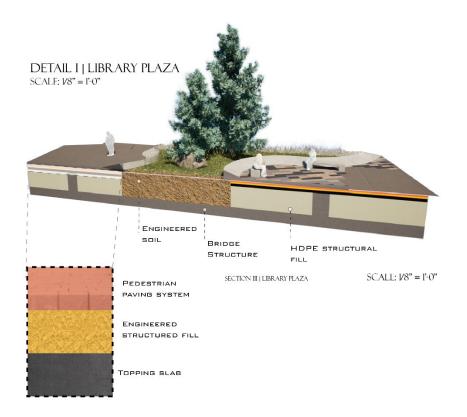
Library Plaza Detail Note: This is a detail of #3 on the master plan.
